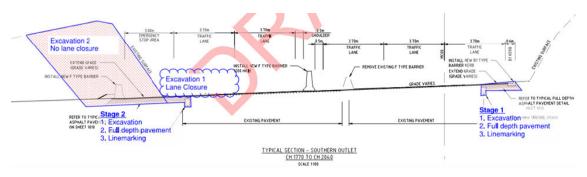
Typical section – Southern Outlet Ch. 1770 to Ch. 2040
